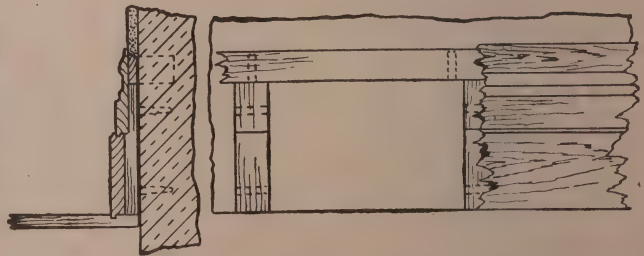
Section and Elevation of Built-up Skirting, etc., showing Method of Fixing.
